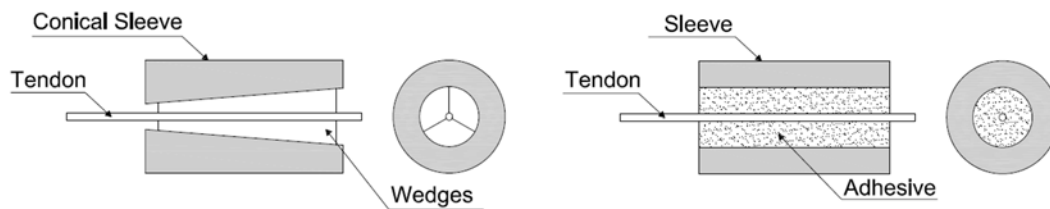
General scheme of a mechanical anchor (left) and an adhesively bonded anchor (right).
